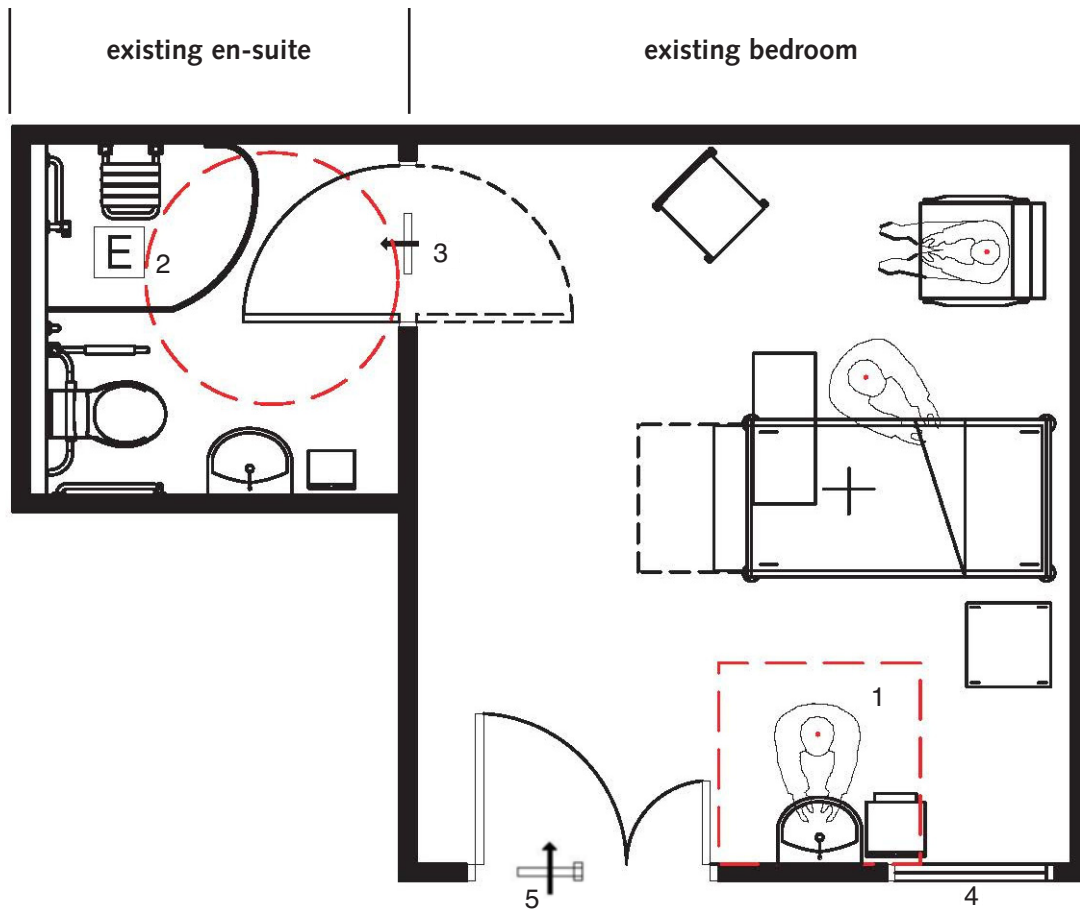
Existing single-bed room with en-suite facilities (segregation/negative pressure rooms)
